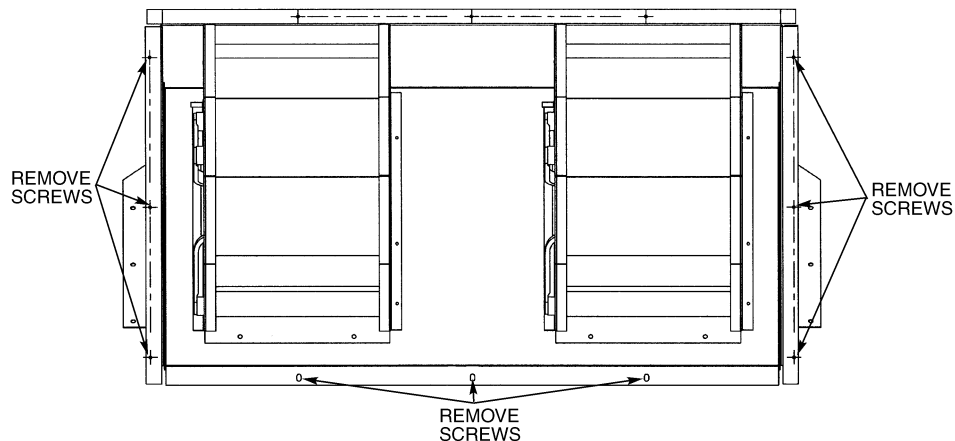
Power Exhaust or Barometric Relief Damper Mounting Details
